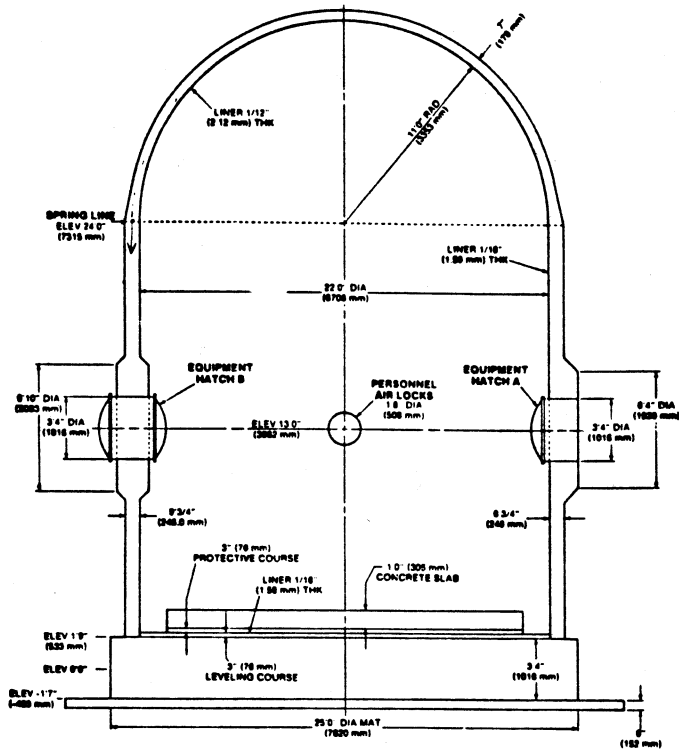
SCHEMATIC OF THE 1:6 SCALE REINFORCED CONCRETE CONTAINMENT MODEL - ELEVATION VIEW
